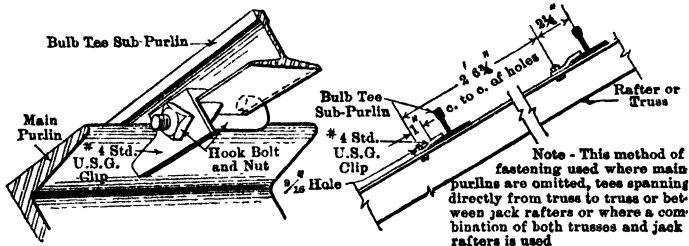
Marks-T-System Poured-in-Place Roof-Construction
